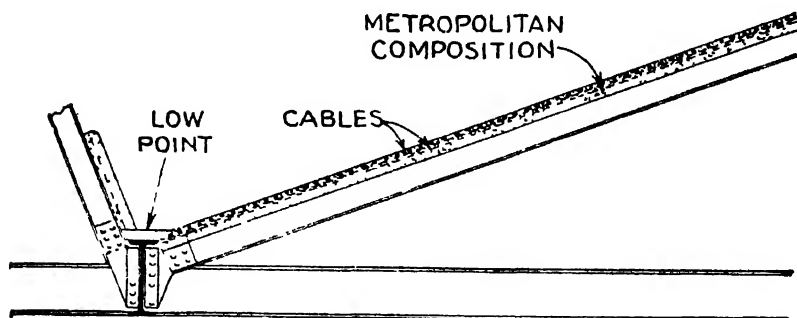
,743.—Standard sawtooth without purlins, fireproof roof construction, lower end.
